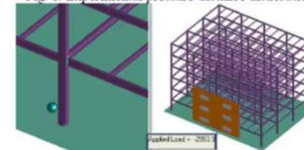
Numerical modelling of external blast acting against a steel frame building
